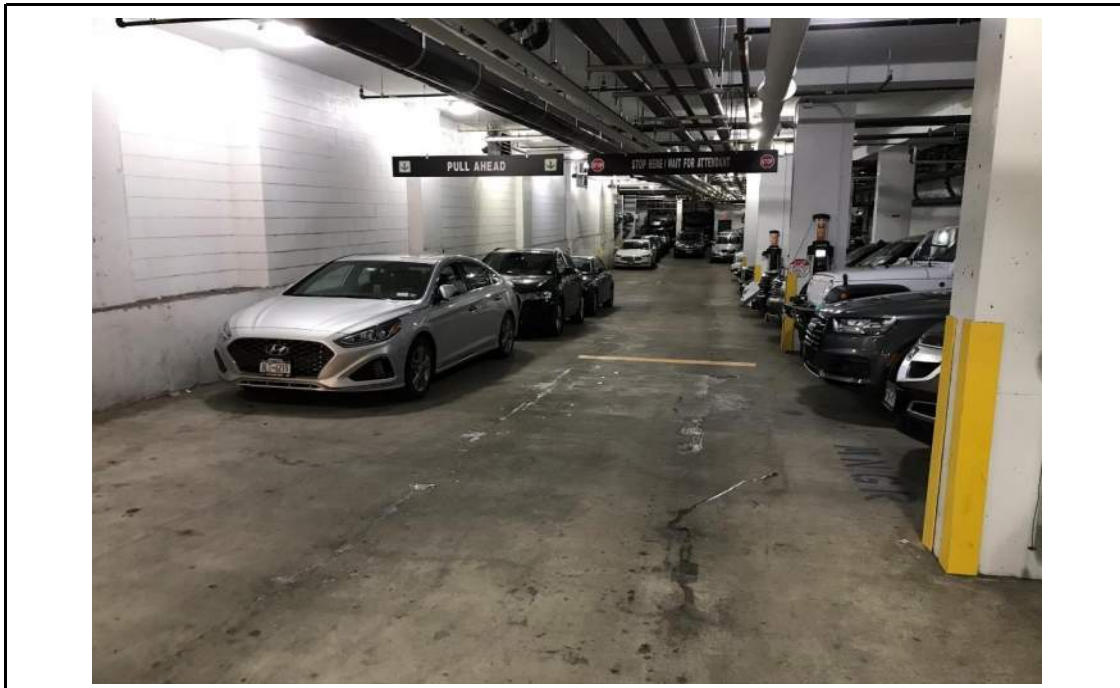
Subgrade parking lot concrete slab, facing east. 6 February 2020.
